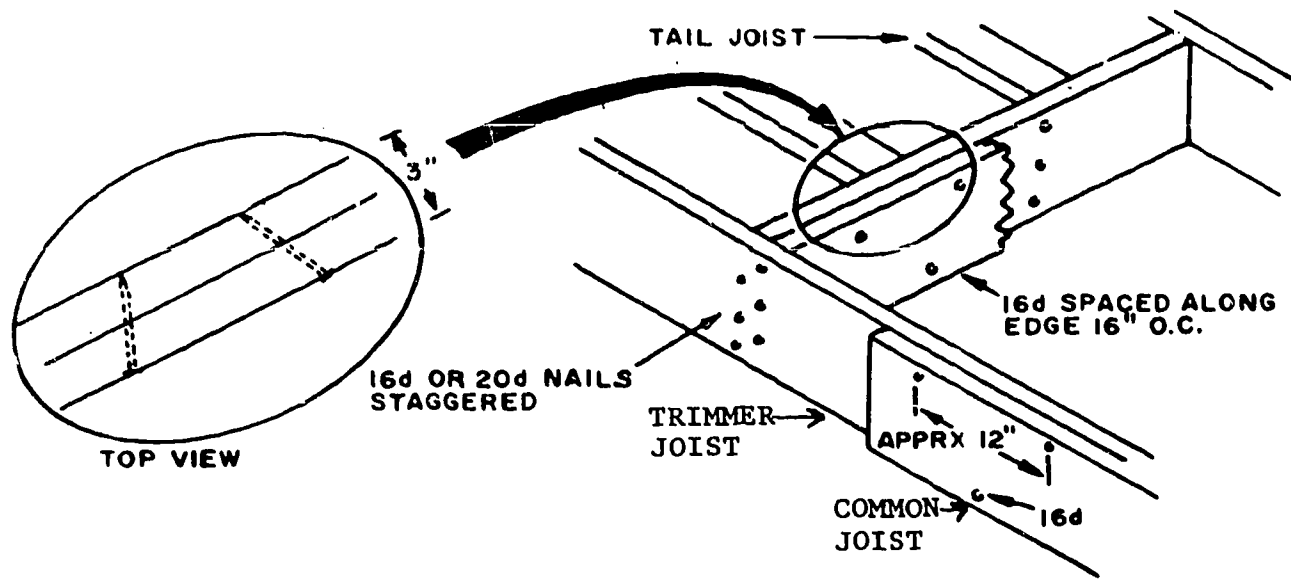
A Nailing Pattern for Access Opening in Floor and Ceiling Joist
